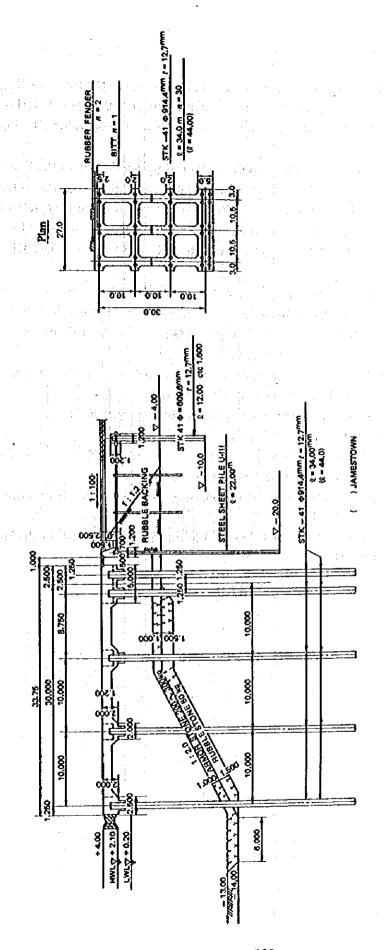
Typical Section of Limestone Wharf (Jamestown, Opobo)
